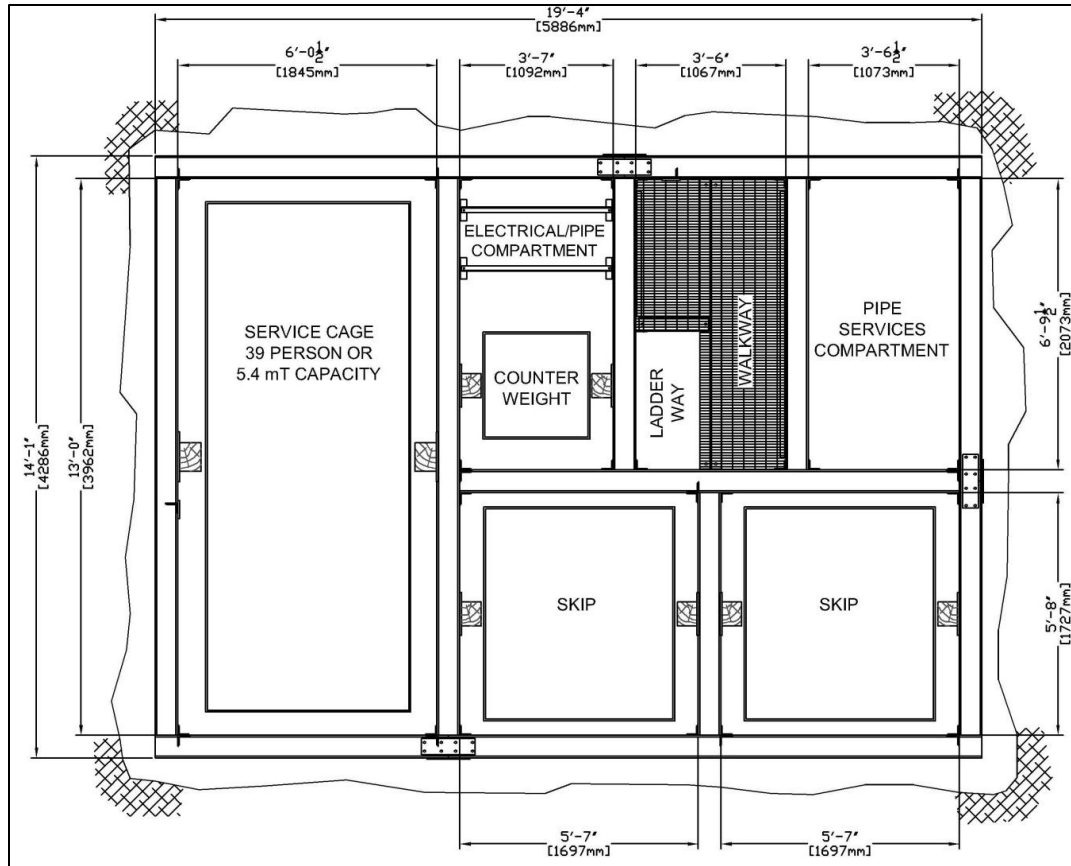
Ross Shaft: Typical Shaft Set (SRK, Courtesy Sanford Laboratory)
